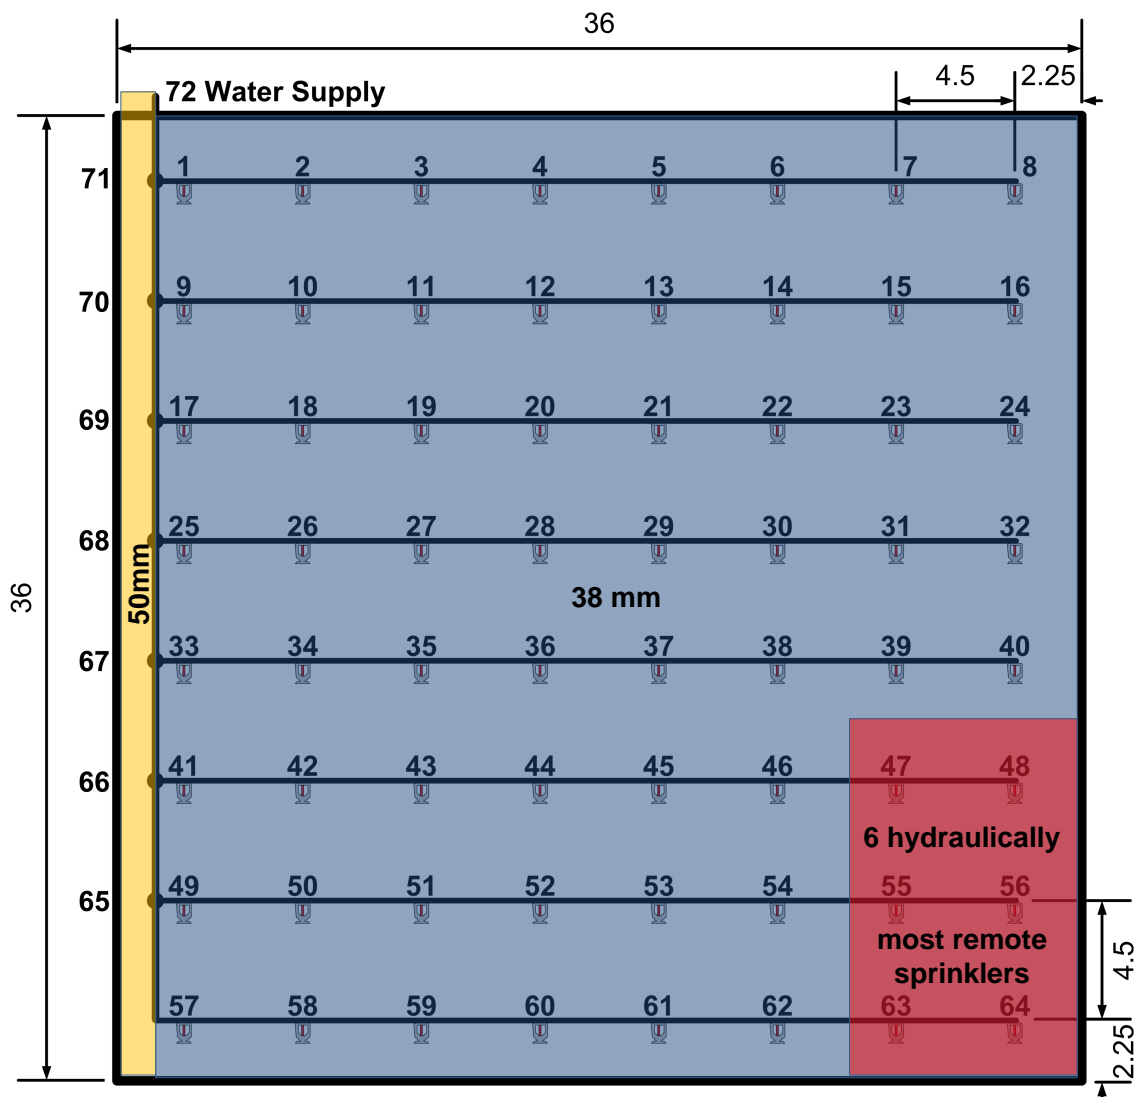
ELH sprinkler layout for one floor of the 140 William Street building. Nodes used for the hydraulic model are shown. Dimensions shown in m, except for nominal pipe diameters shown in mm.
